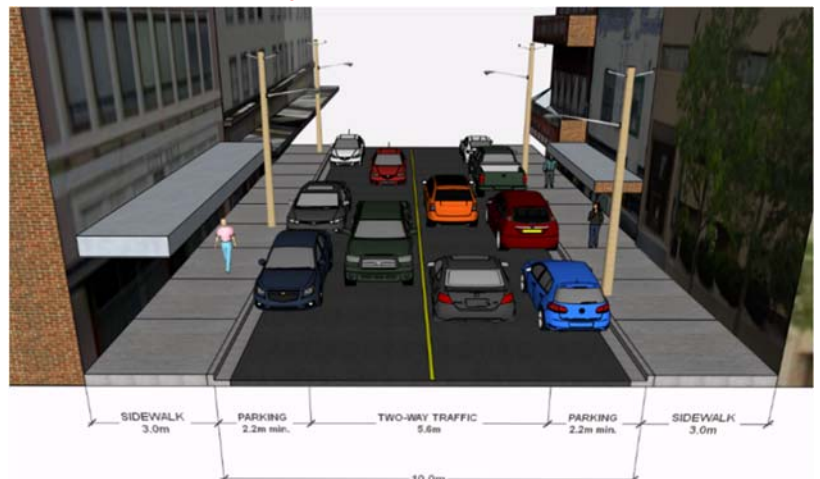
Gottingen Street Typical Cross Section Looking South
